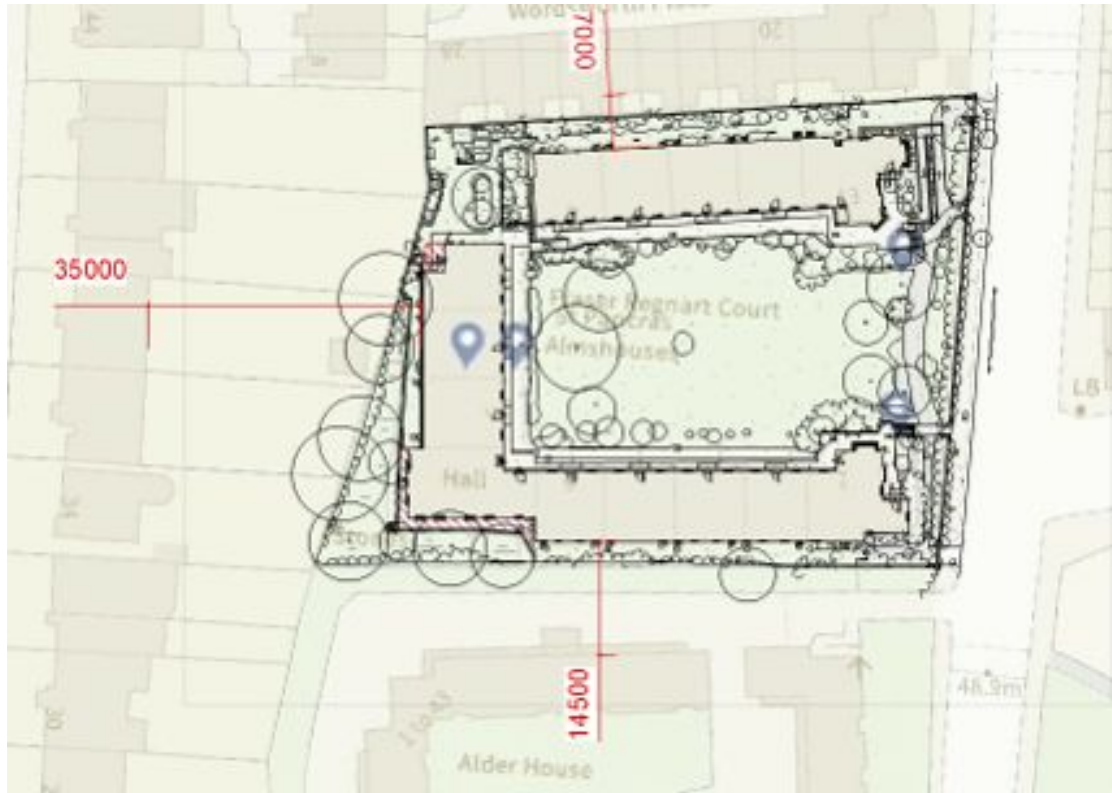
Plan showing adjoining buildings and dimensions from ASHP locations
